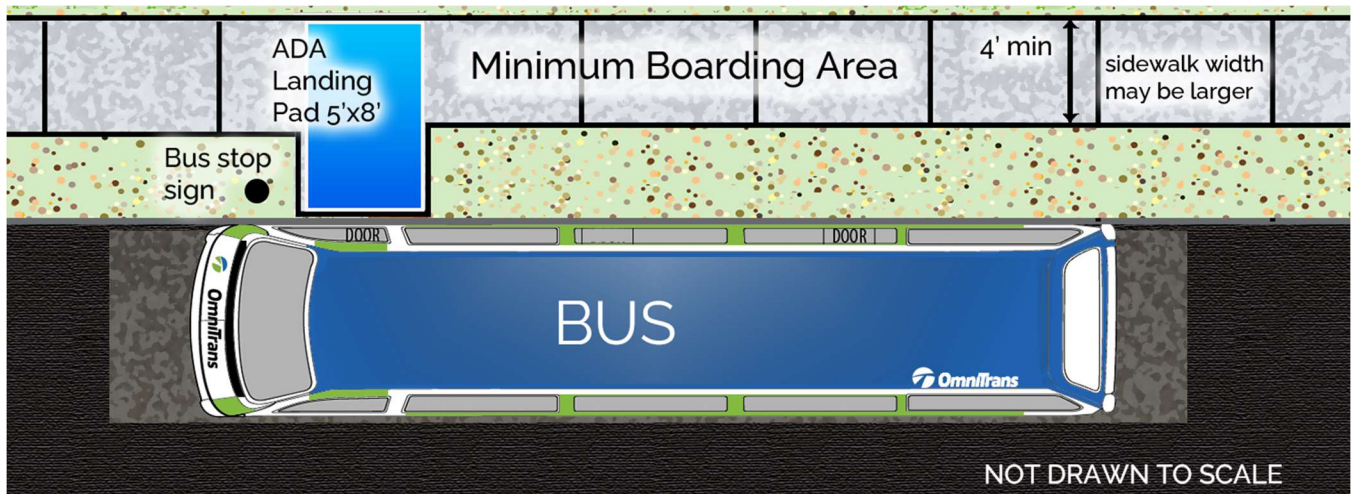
Minimum stop dimensions for sidewalk behind parkway strip.
